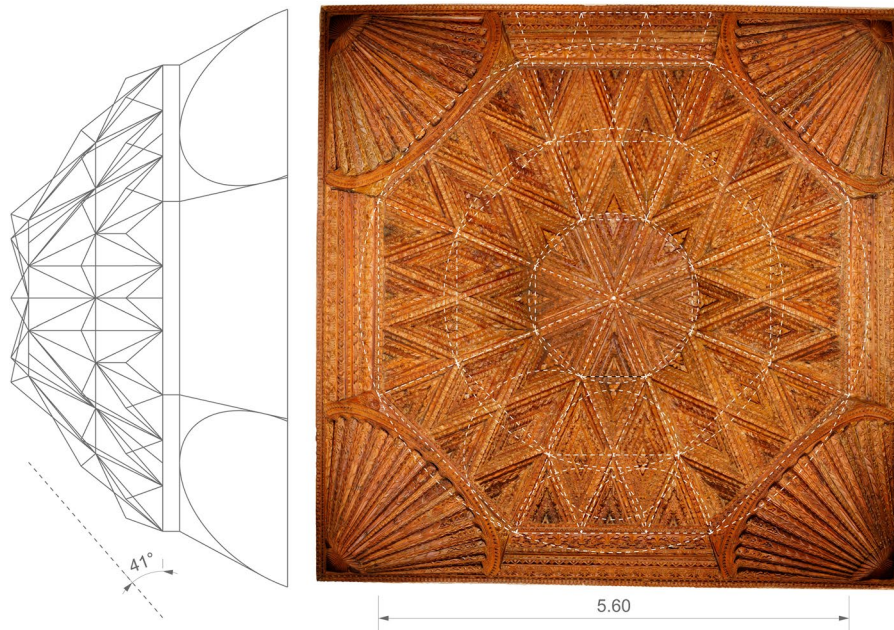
Shell room. Plan and elevation of the coffered ceiling. Image by the authors. The corners are resolved with shell-shaped pendentives. The rhombuses are formed by drawing parallel lines to the sides of the trapezoid on the side panel.
